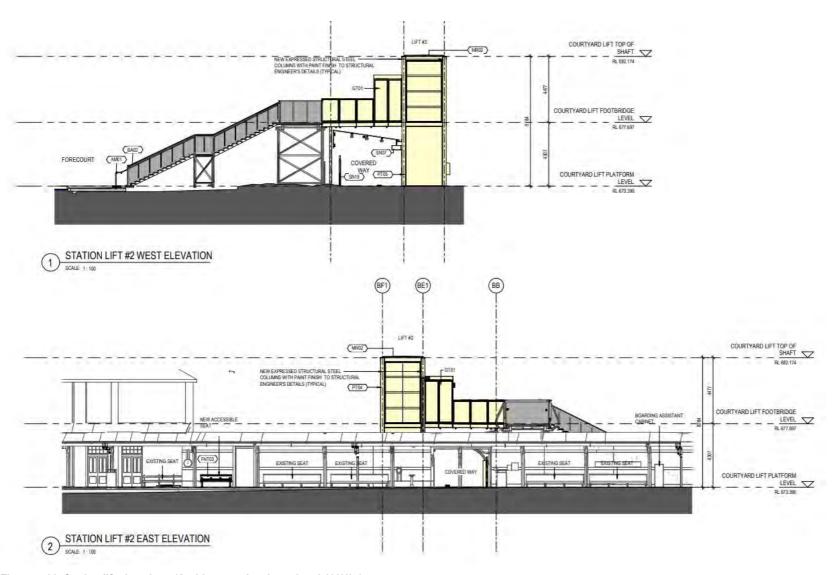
Station lift elevations (Architectus, drawings dated 19/1/24)
